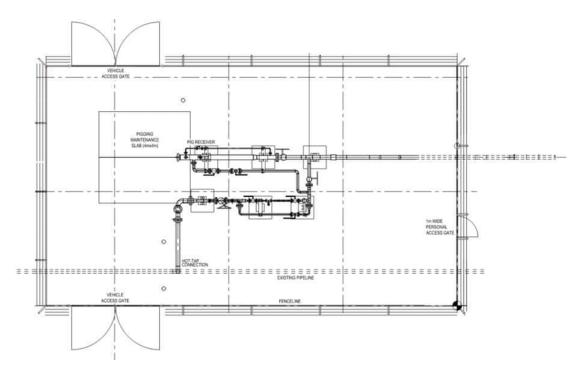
Typical Layout Schematic for the Shenandoah Facility
